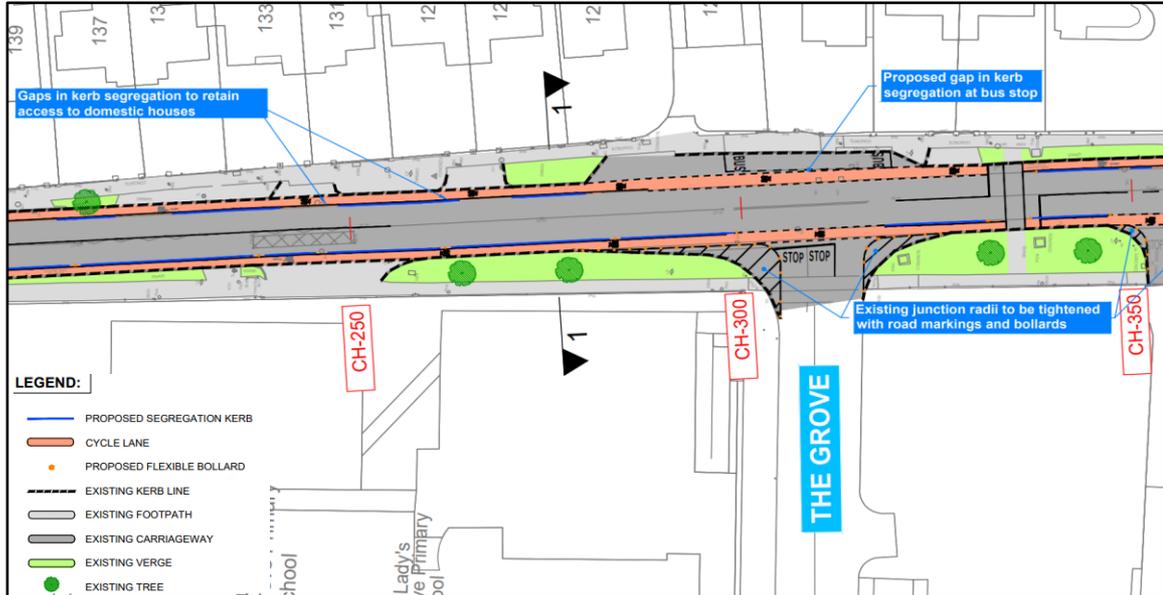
Extract from Goatstown Road Protected Cycle Lanes Sheet 1 of 5
